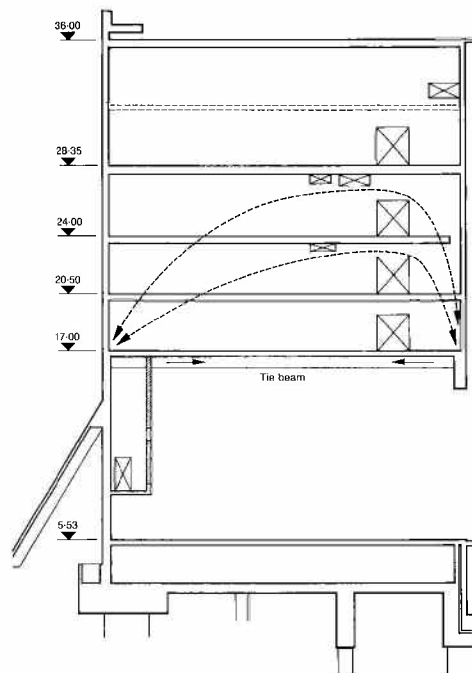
Section through deep beam walls of fly tower and lyric theatre showing action of forces
